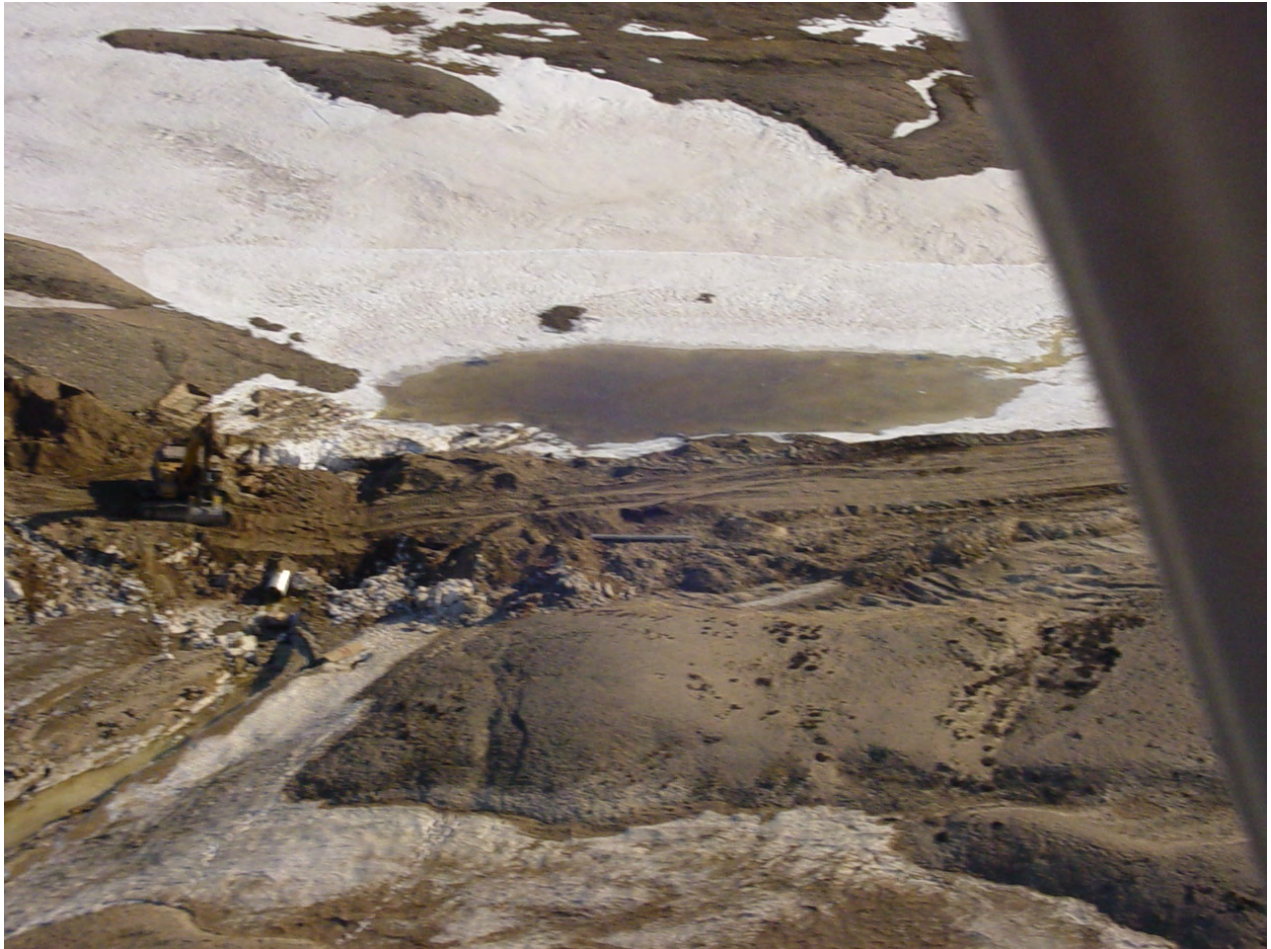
May 16, approximately 11 AM – Aerial view upstream showing auxiliary 1.0 m diam culvert, existing 1.0 m diam culvert (not washed out) is located below new installation (not visible in this photo).
